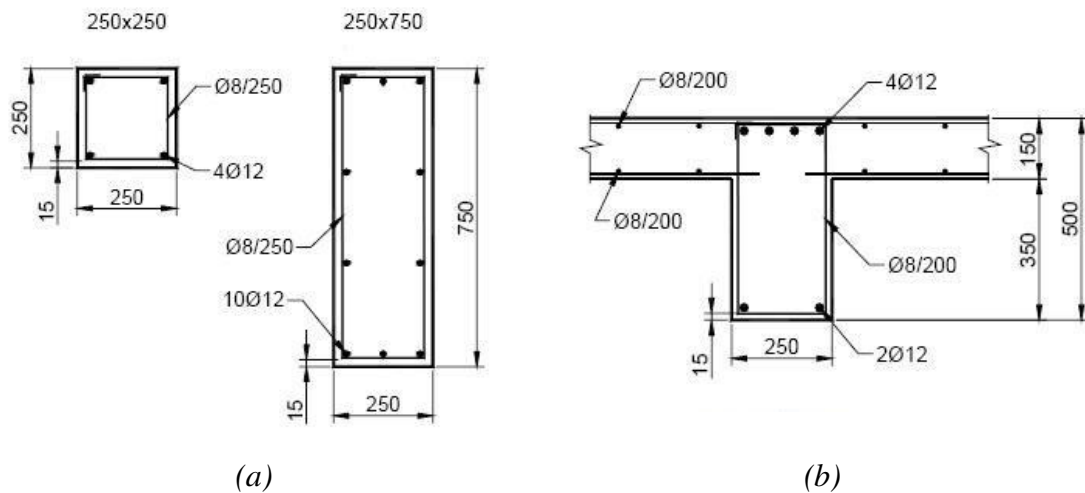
(a) Columns sections (mm), (b) Typical beam sections (mm).
